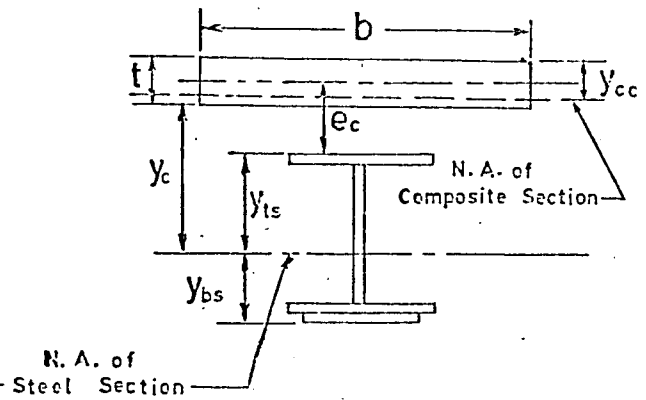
COMPOSITE BEAM SECTION (N.A. IN SLAB)
